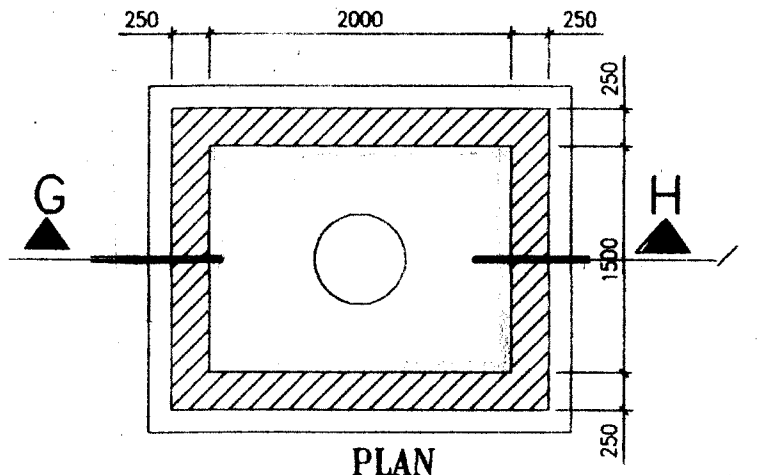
DETAIL PLAN OF SEPTIC TANK & CHLORINE PIT
